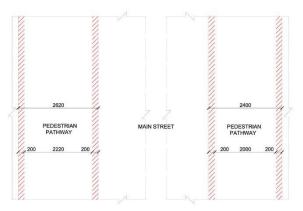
Street width and buffer spaces (in mm) for Gateway 7 in the area surrounding Offenbach am Main Hauptbahnhof
